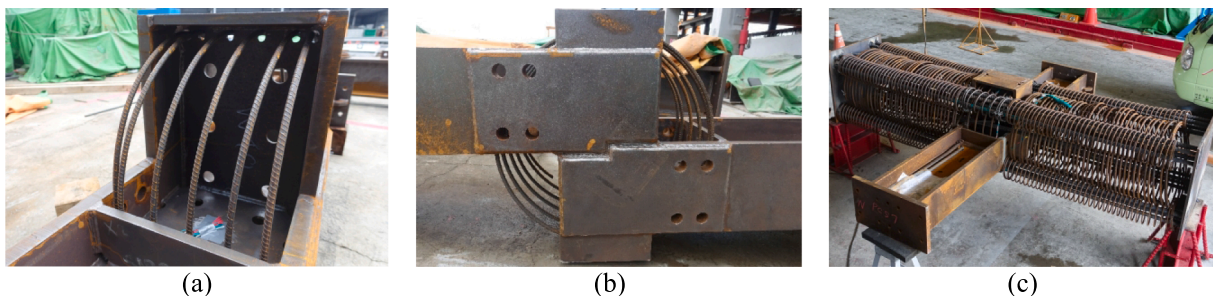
Construction of specimens: (a) large spirals within the joint, (b) the doubler plates (eccentric joints), and (c) steel beams and reinforcement cage of the column.
